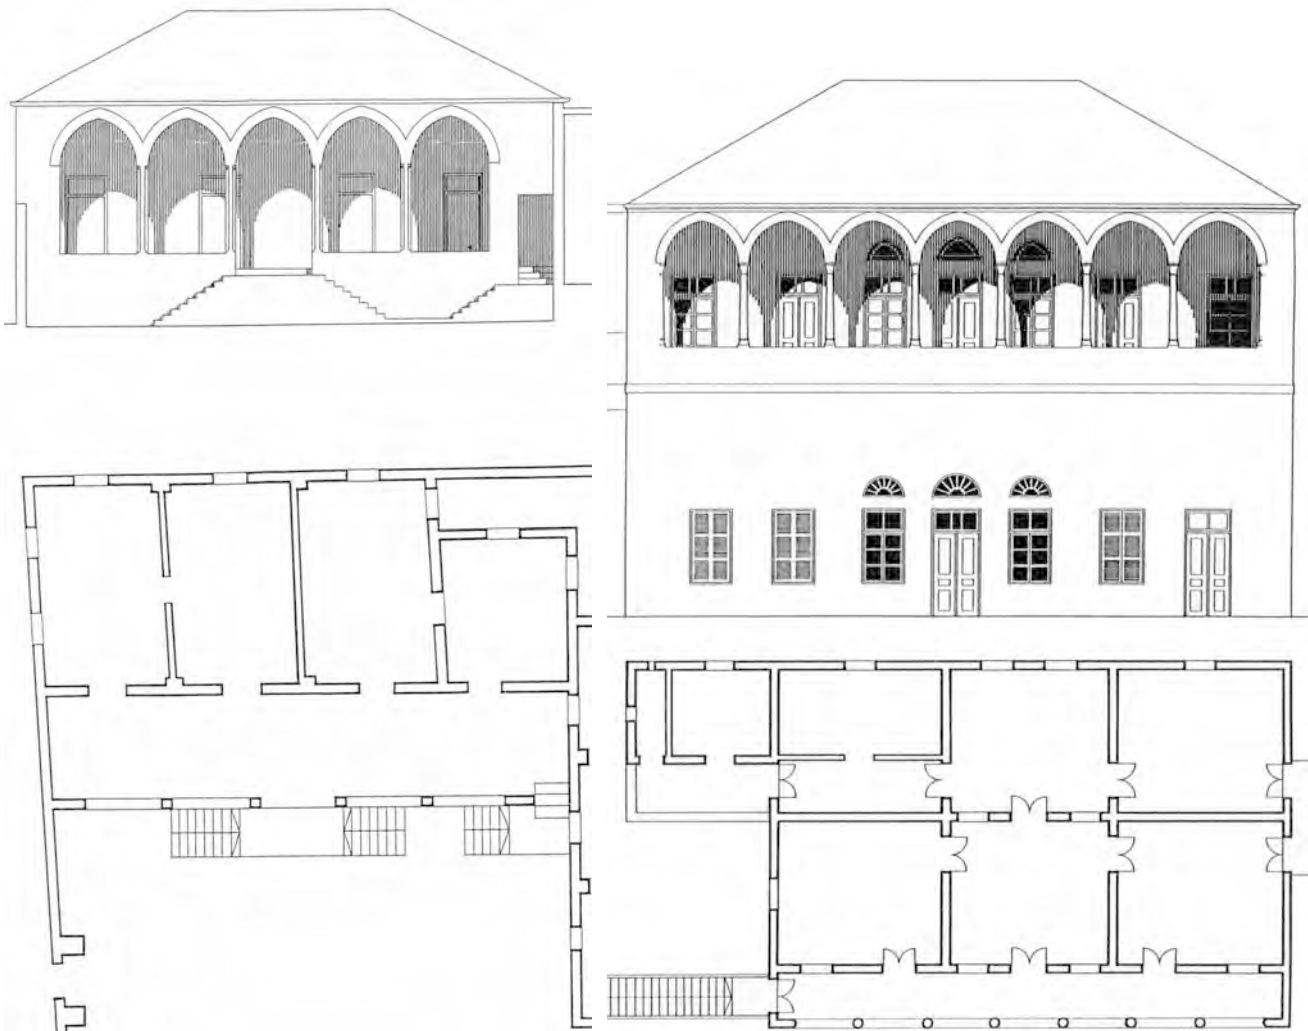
Shivat Zion Str. and Wadi Salib Str. intersection. Plan and elevation of a unit in a larger complex. Demolished shortly after 1995.
